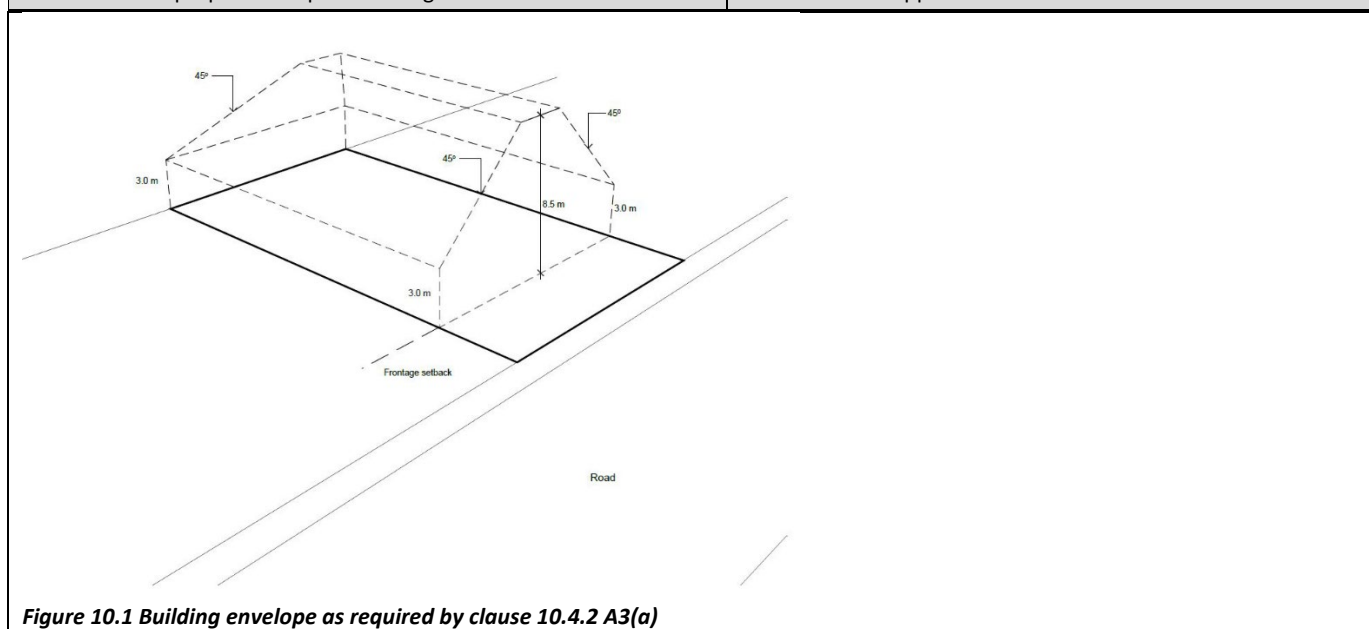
Building envelope as required by clause 10.4.2 A3(a)
